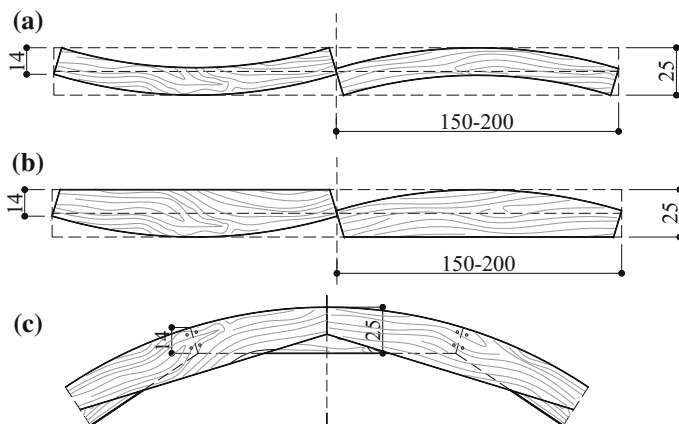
Rules of constructing arches from arch centres [13]: a, b methods of cutting out arch centres from straight planks, c connecting method process of arch centres into a scaffolding bar. The dimensions are specified in [cm]
